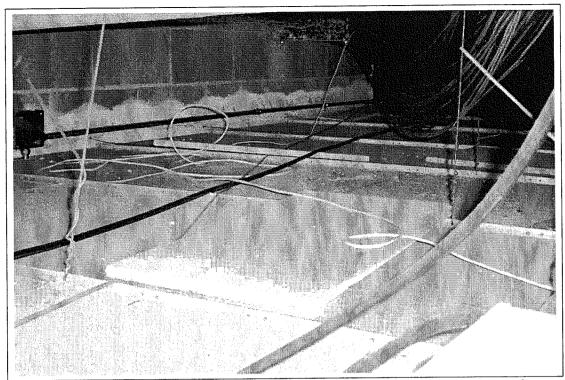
ground floor meeting rm – view of delaminated fireproofing on top of suspended ceiling
